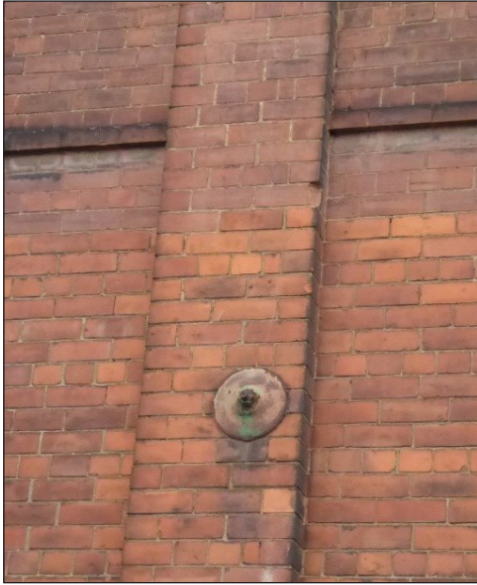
Variations in brick hue to the existing west elevation (© Historic England, photograph: Alastair Coey Architects 2019)
